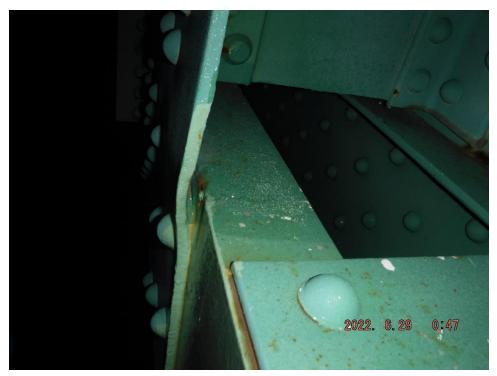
Free edge localized deformation with pack rust at unrepaired gusset edge (Span 8, North Truss, L25, North Gusset shown)
